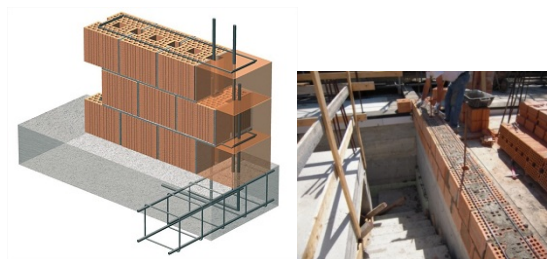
Example of Reinforced Masonry Structure. Above: Typical/ideal disposition of vertical reinforcements and stirrup bars; Below: realization on field
